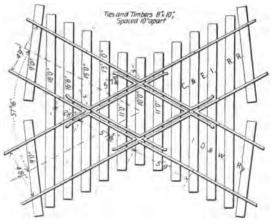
Track Crossing Laid on Ties and Long Timbers.
